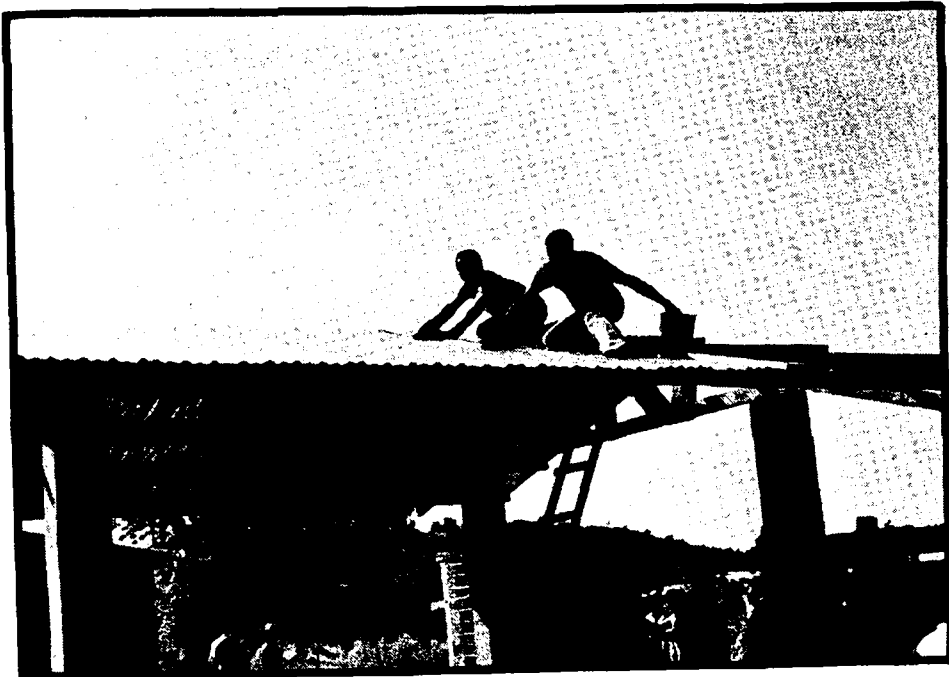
Trainees nailing the roofing on the water catchment hangar.
